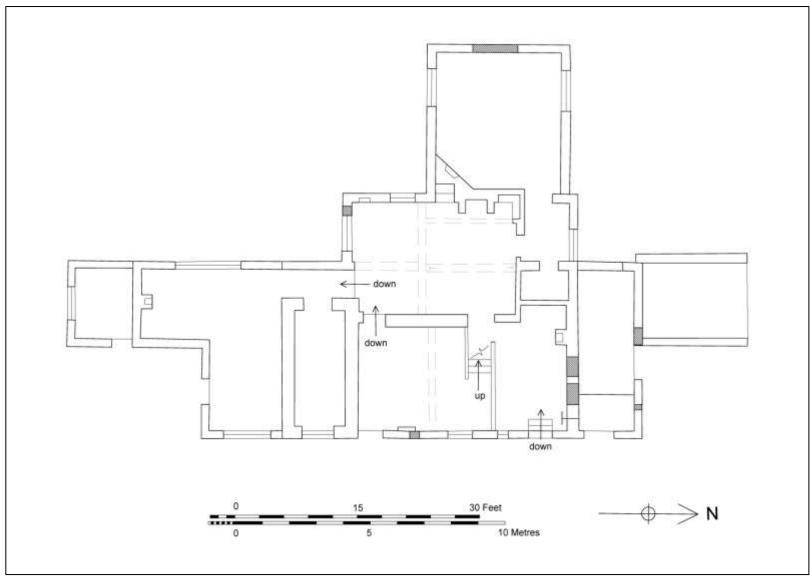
Ground floor plan (derived from Bosworth Design survey)
